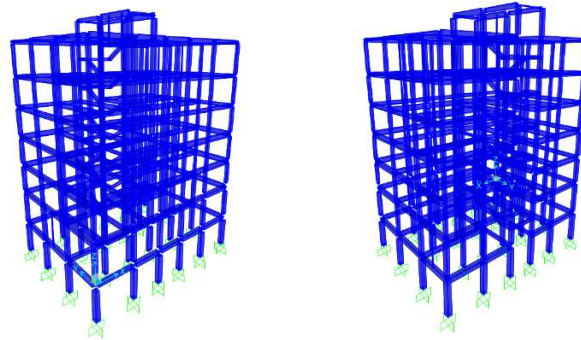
South-west and north-east views of the finite element model of the bare frame structure.
